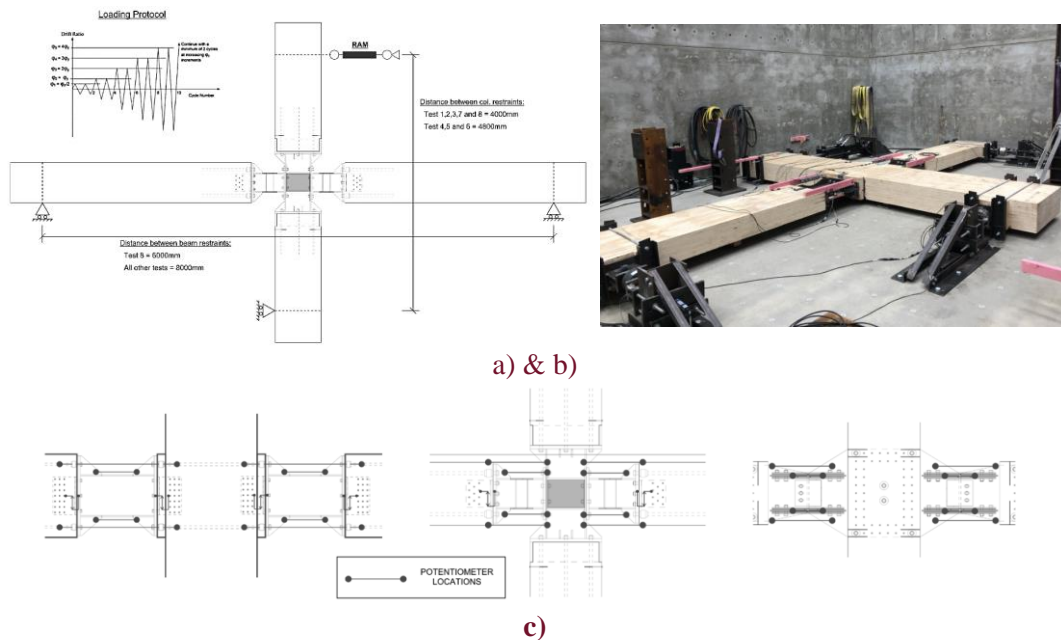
Test set-up and loading protocol: a) Loading protocol and beam/column reaction points, b) Image of test setup, c) Beam-column joint potentiometers.
